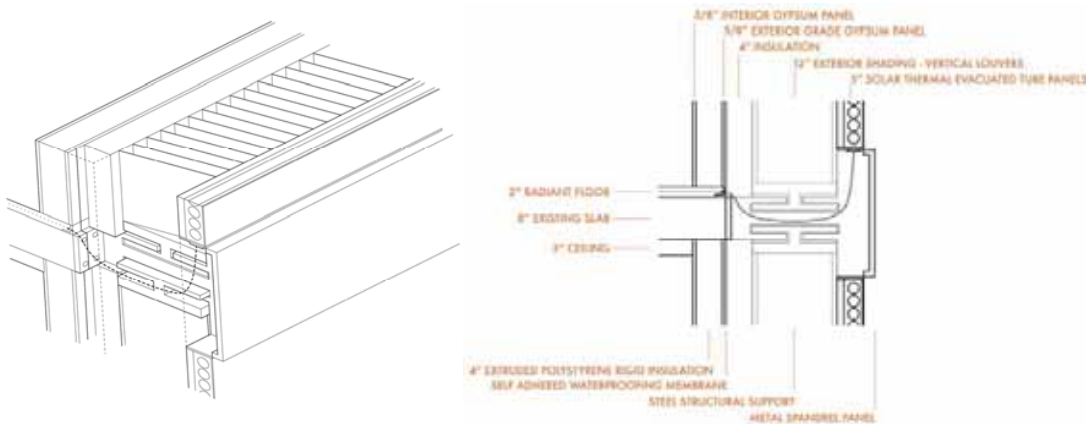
Axon (left) and section (right) of the floor slab to exterior wall assembly detail. Source: (Author 2013)
